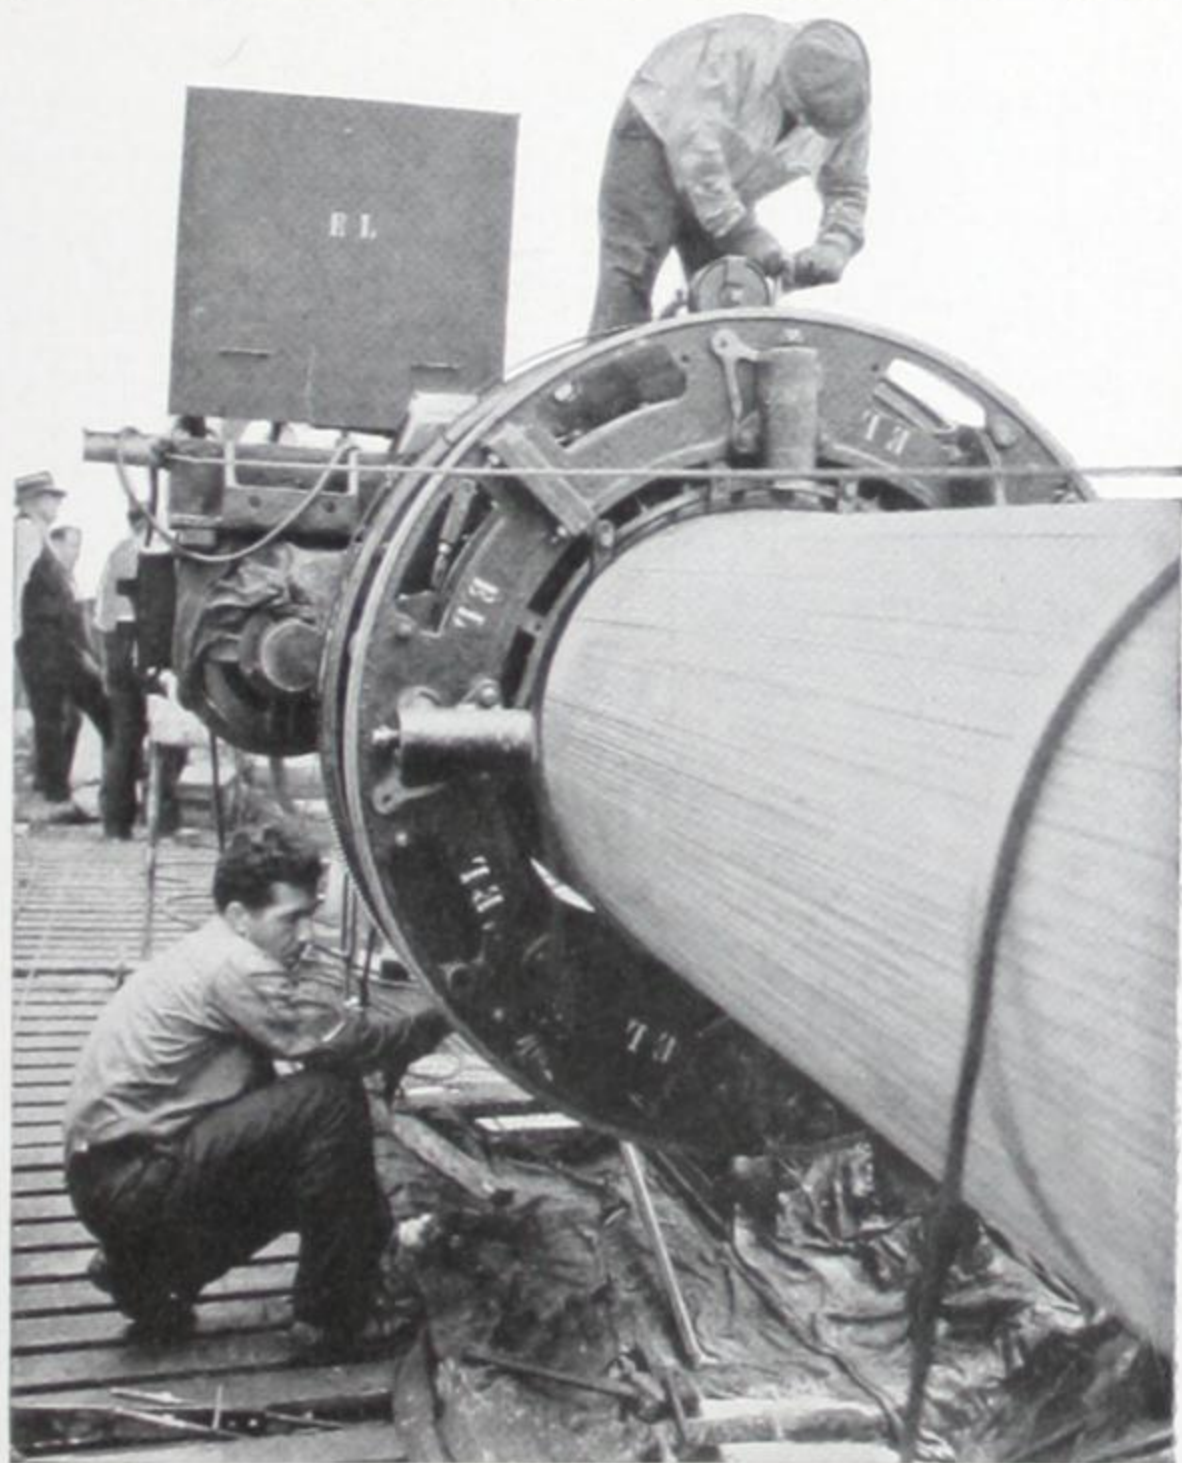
The Roebling type of Cable-Wrapping Machine.
